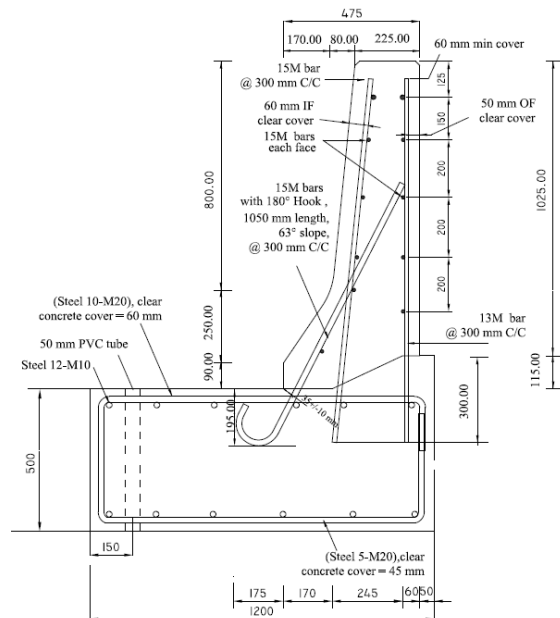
Specimen B-4 for interior portion with 180° hook embedded in thick slab at 300 mm spacing
